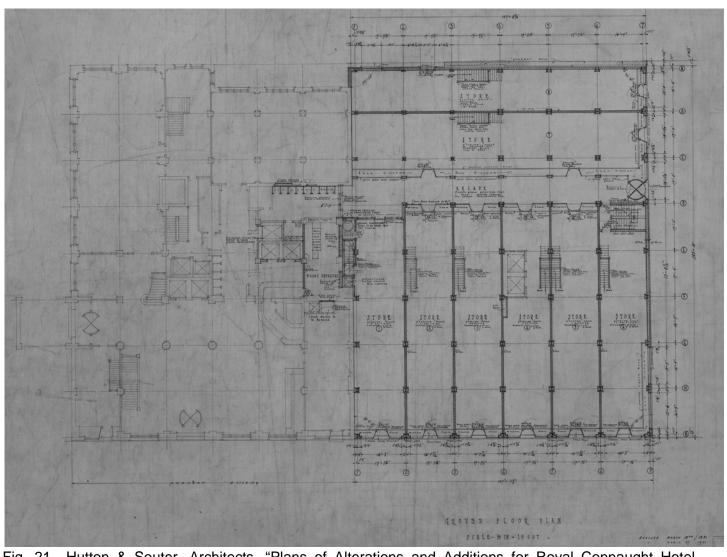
Hutton & Souter, Architects, "Plans of Alterations and Additions for Royal Connaught Hotel Hamilton," 27 Apr. 1931, Souter, Bell, Howard and Souter Fonds, Archives of Ontario, C12-1-0-458, Container # L-717, Barcode B732587, Drawing No. 2 – Ground Floor Plan.
